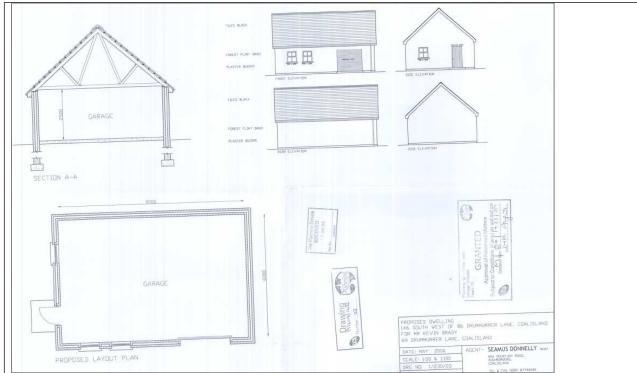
Floor plan and elevations of garage approved under M/2006/1433/RM
